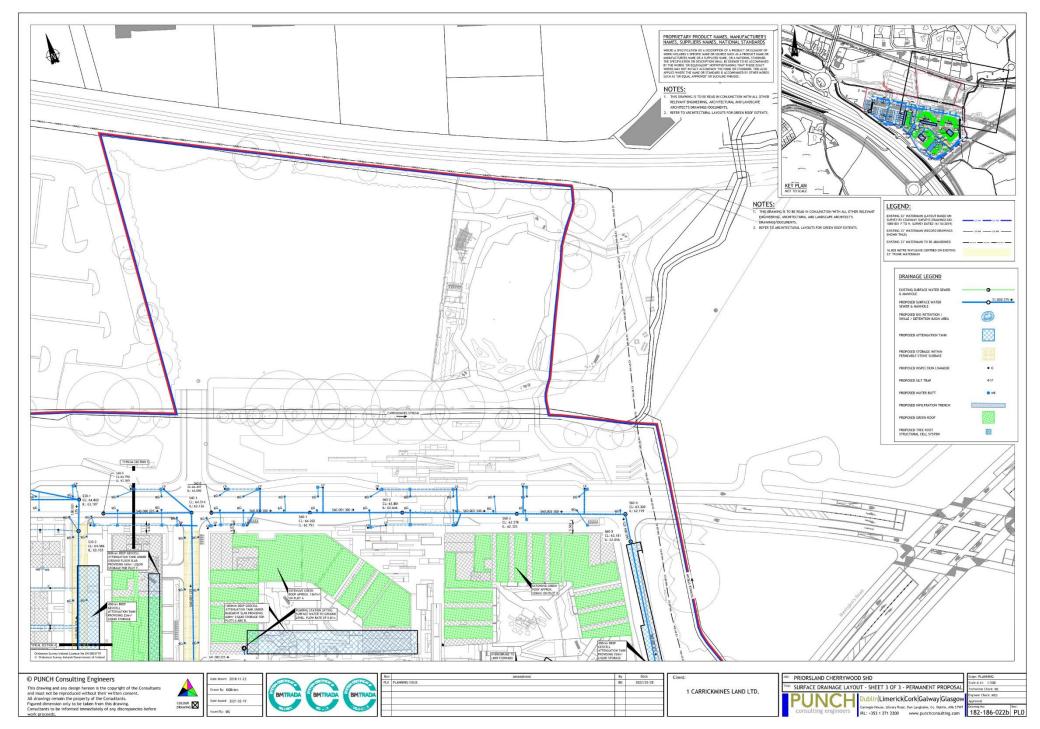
Surface water drainage – Permanent Proposal (sheet 3)
